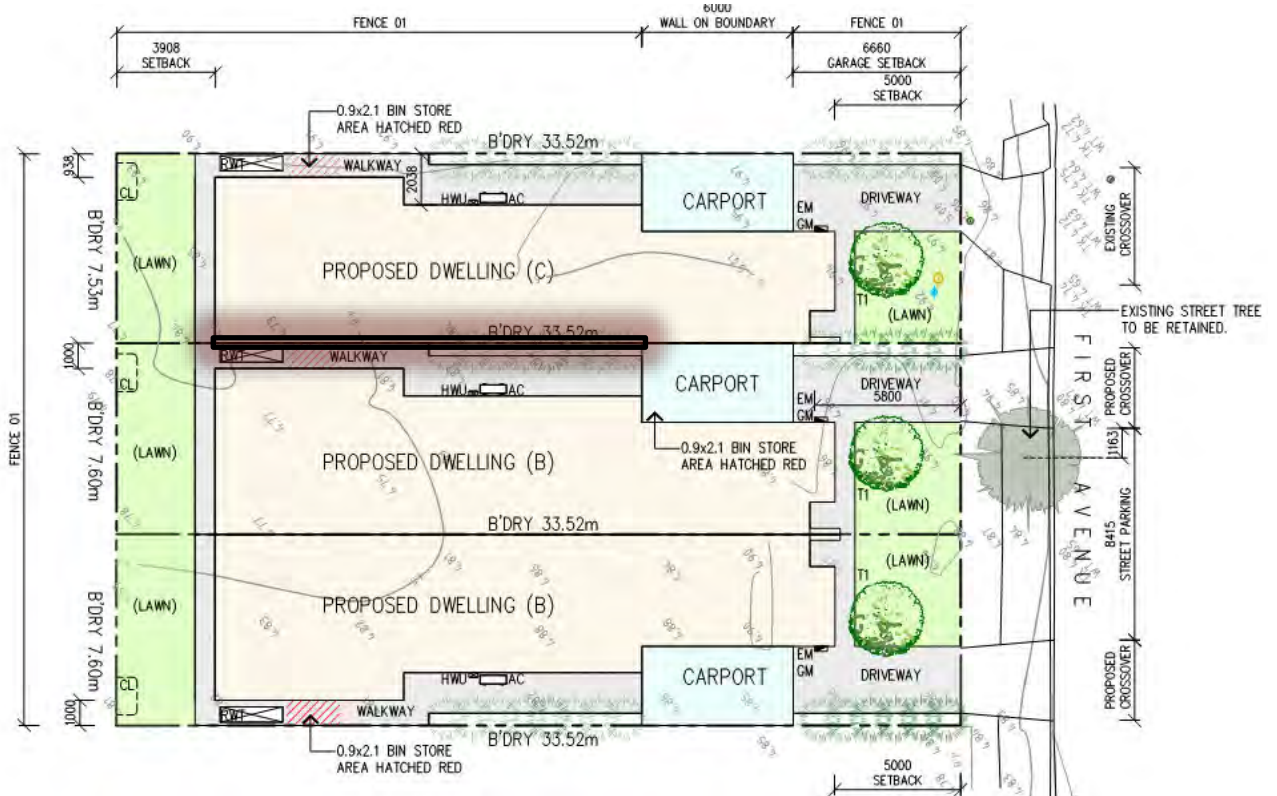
Plan showing common row/terrace type development with walls not simultaneously abutting
